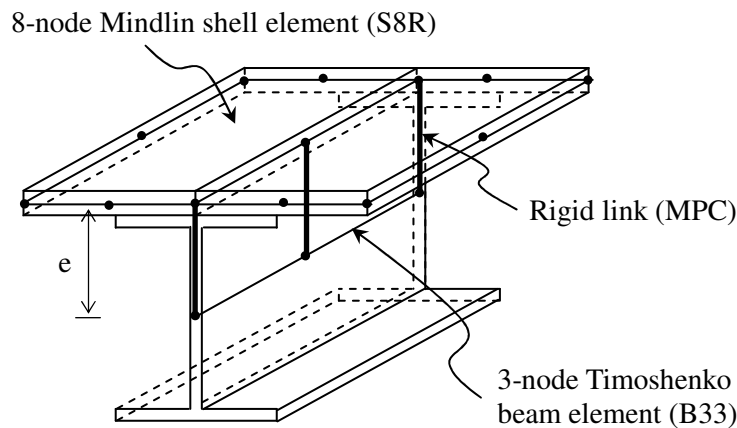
Finite Element Eccentric Beam Model for Slab on Girder Bridges
